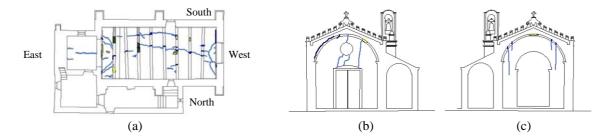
Crack pattern: (a) ceiling of the chancel and barrel vault; (b) façade; (c) chancel arch.
